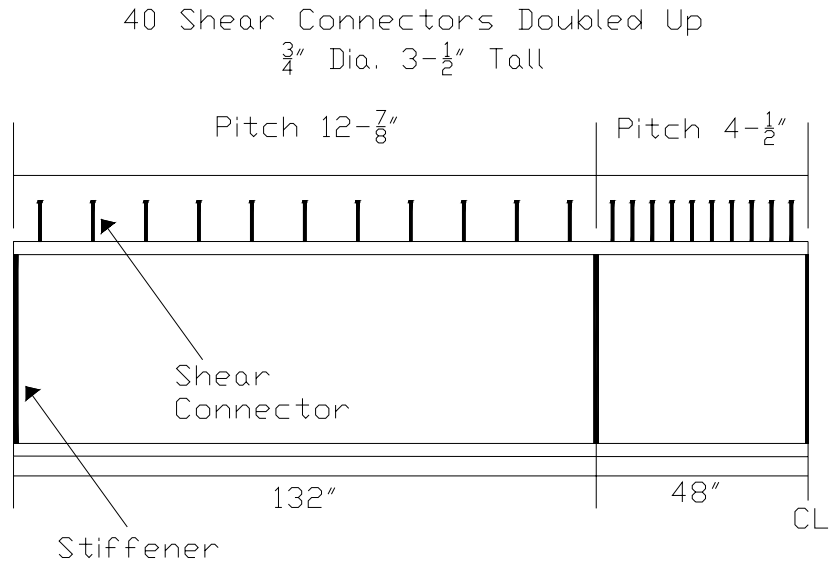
Longitudinal View of Test Specimen, with Shear Connector Spacing
